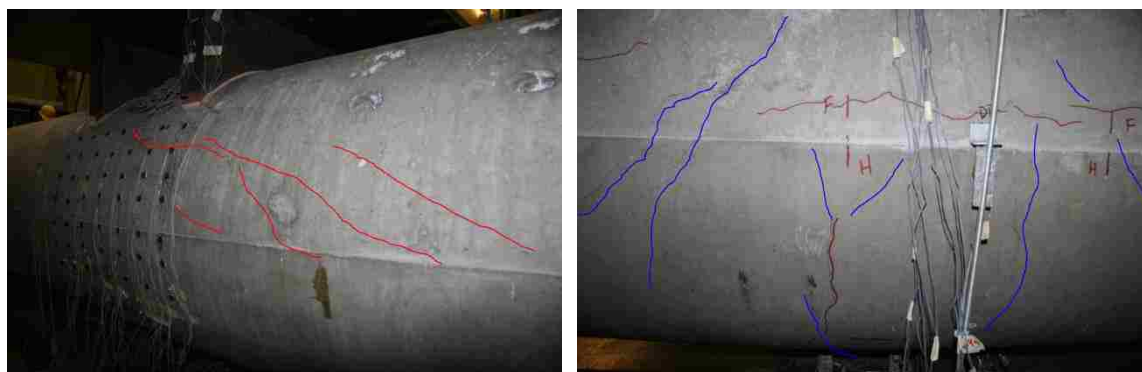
Progression of cracks on the west (left) and east (right) faces of specimen
